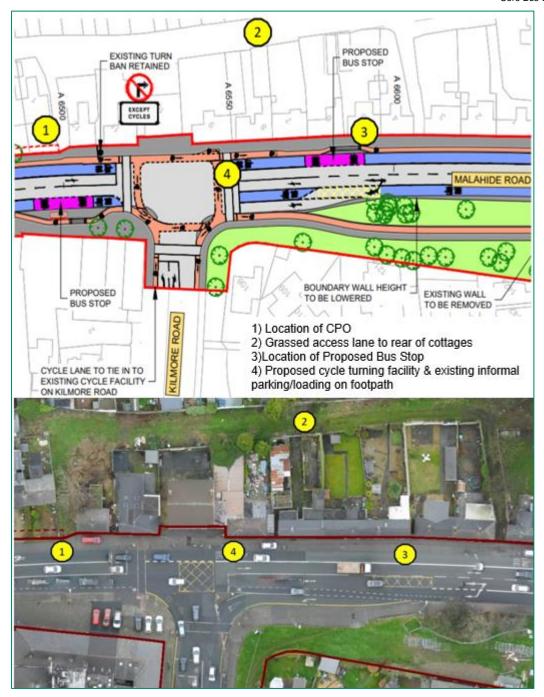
General Arrangement, Existing Layout and Key Features of Proposed Scheme at Artane Cottages Lower
